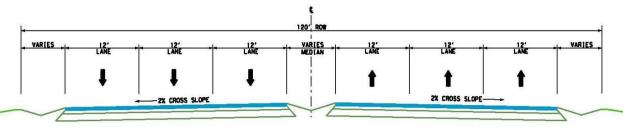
Typical Section – P6D and M6D Six-Lanes Divided with Median Source: Collin County Engineering Department Note: Not to scale
